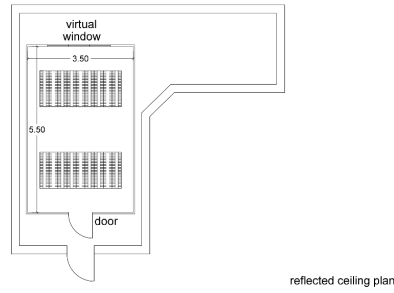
The reflected ceiling plan of the test room showing the luminaire layout.
